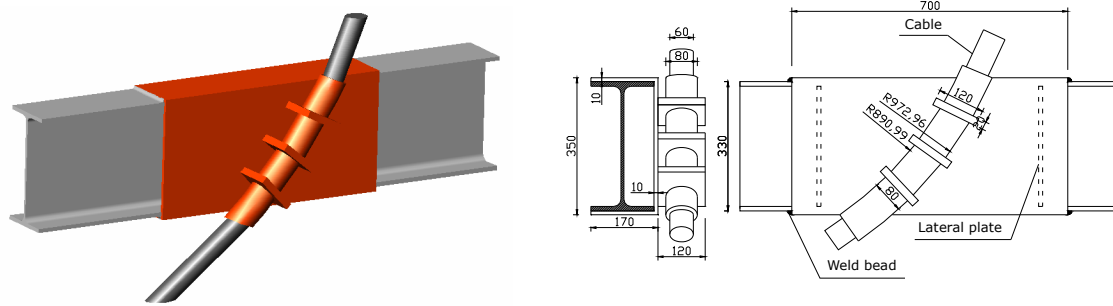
DC-Retrofit: View and Details of a Deviator in the Hypothesis of a Welded Connection to the Floor Beam
